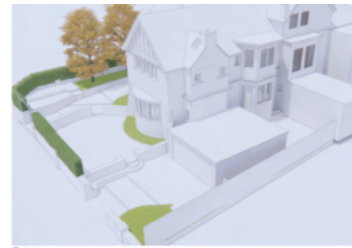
Showing the garage being demolished and the proposed new storage enclosures to the front and rear elevations
